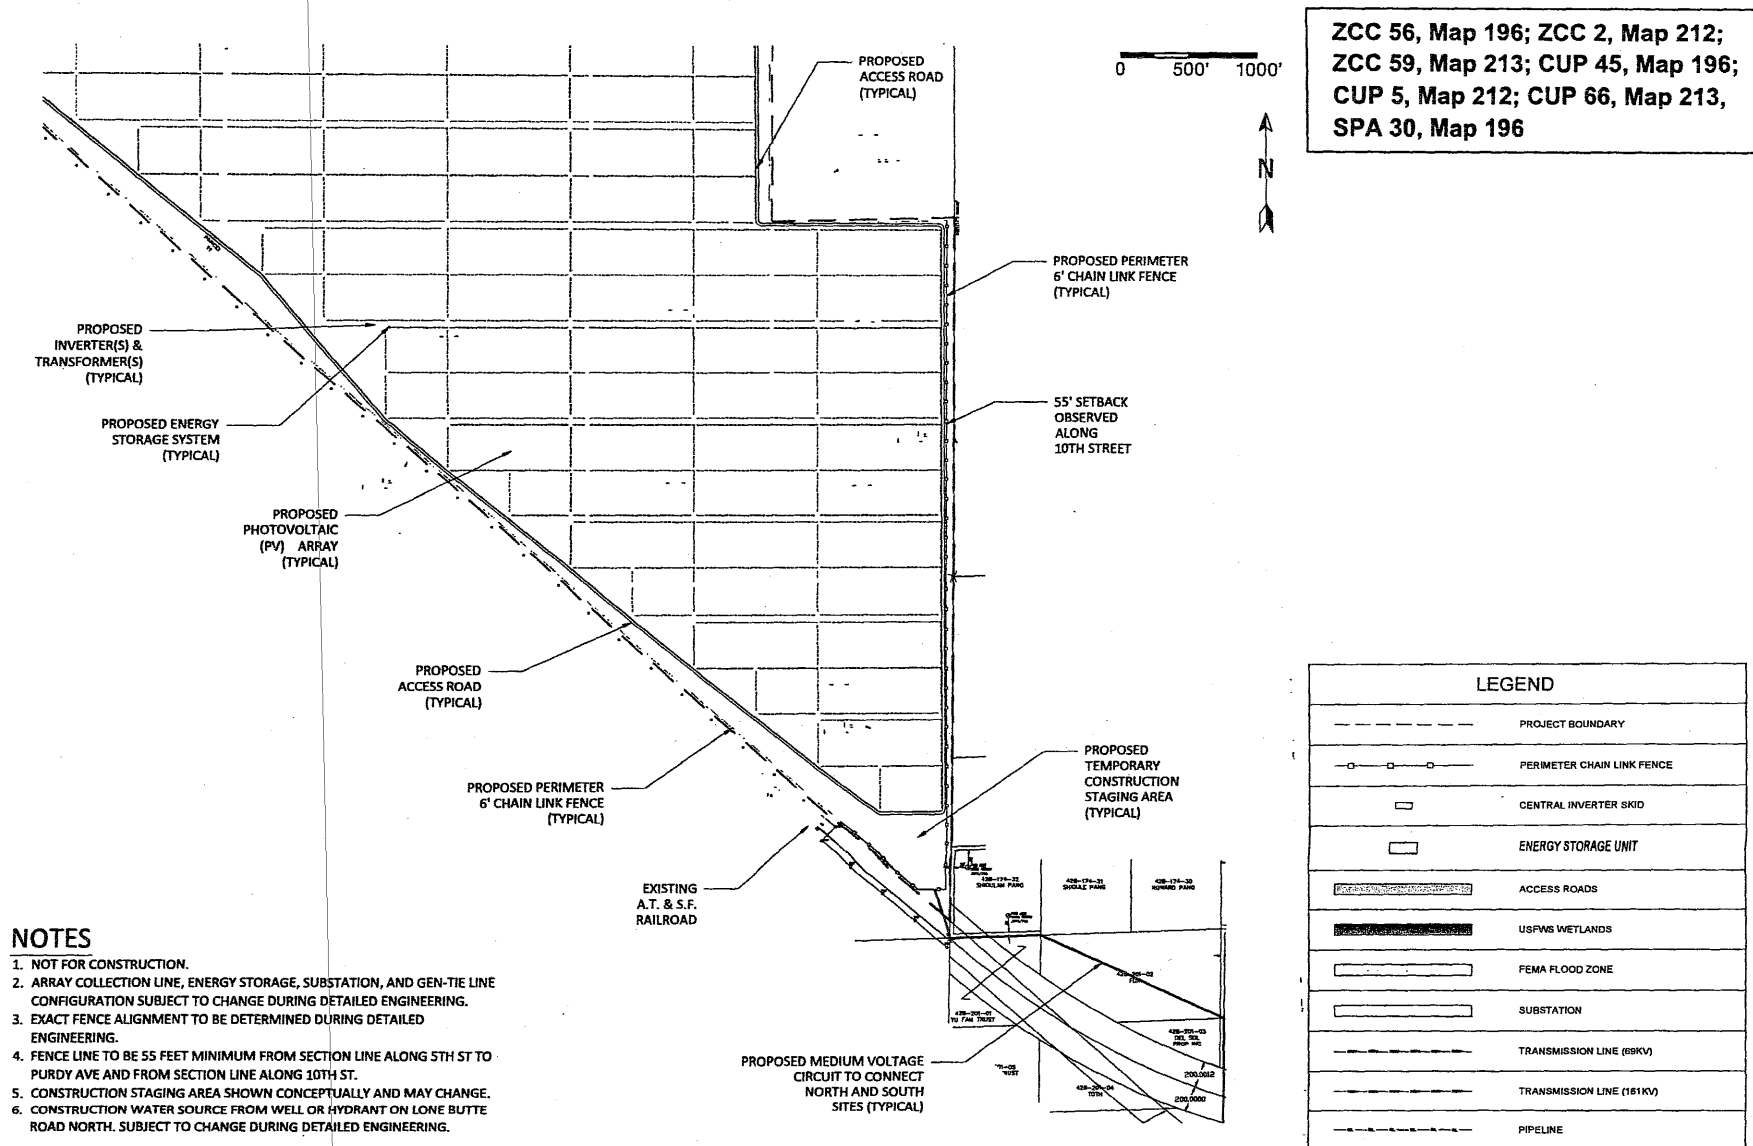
B: NORTHERN SITE PLANS - PART 2
